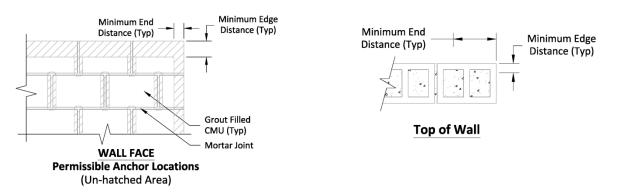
ULTRACON+ SCREW ANCHORS INSTALLED INTO GROUT-FILLED CONCRETE MASONRY
